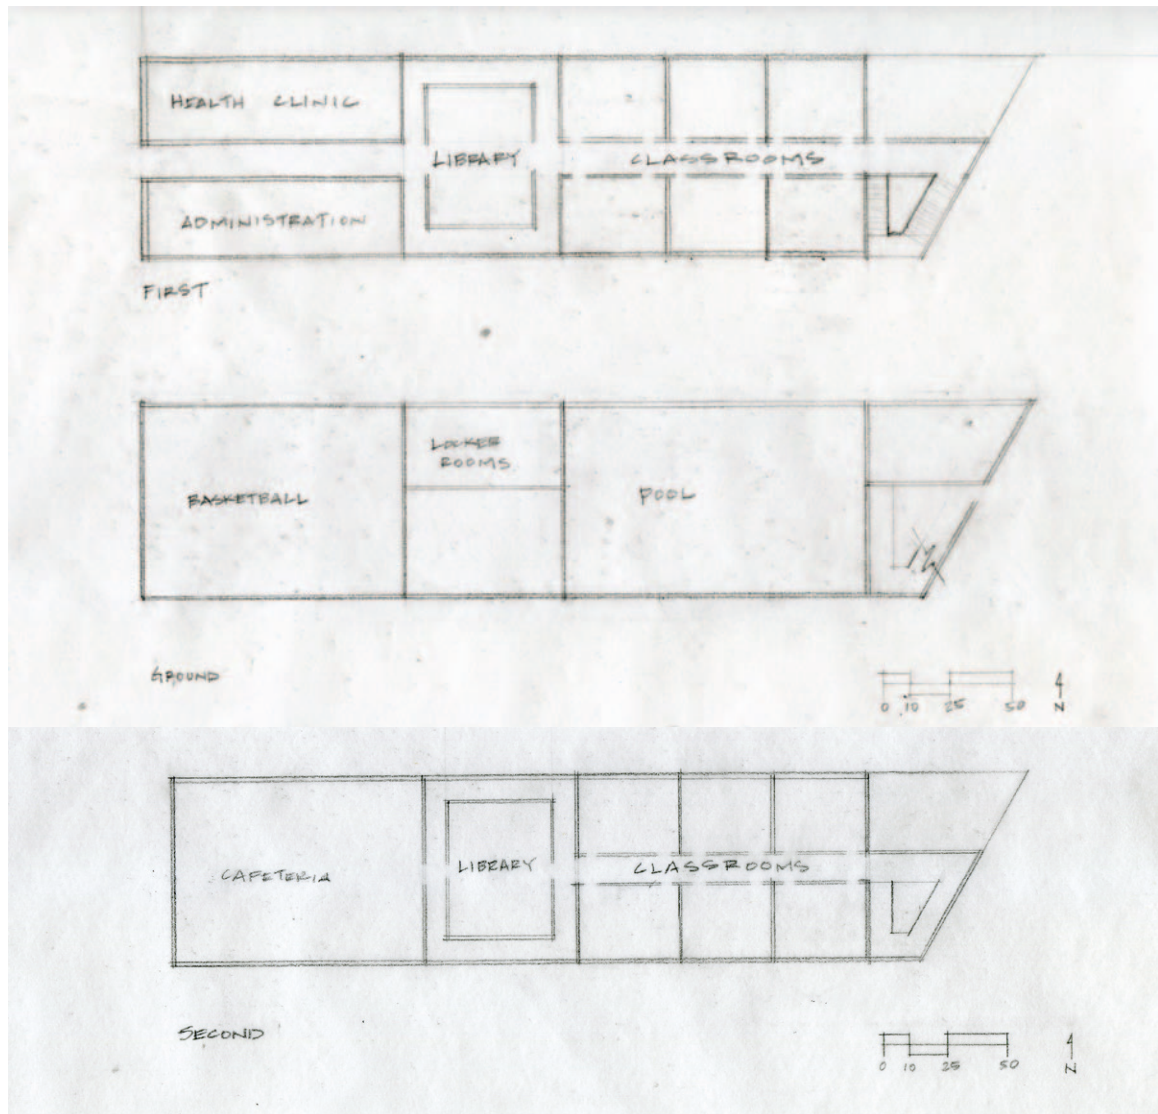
Schematic Plans - Entry Level, Ground Level, Second Level
